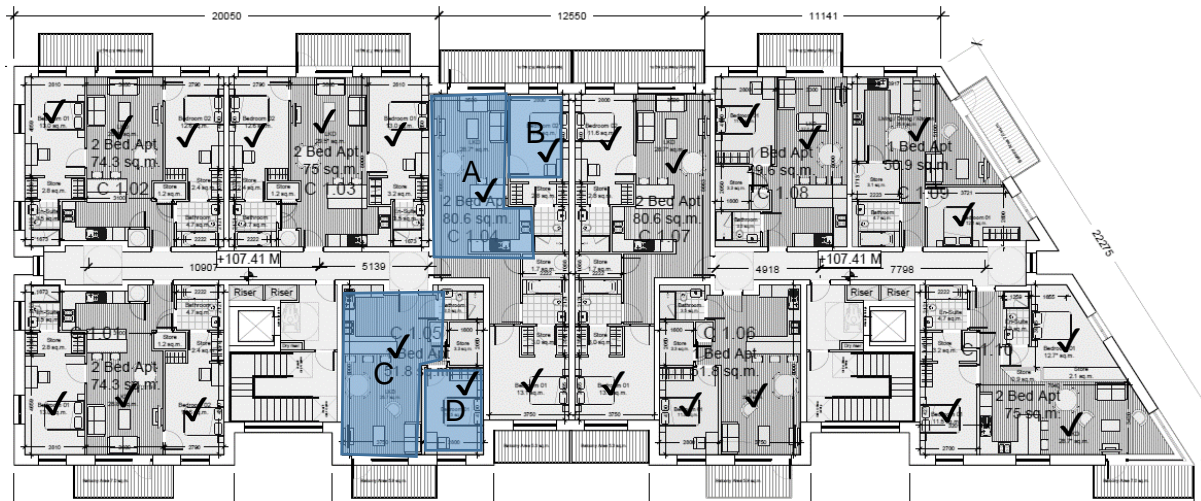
Block C - First Floor Assessed Rooms Highlighted in Blue
